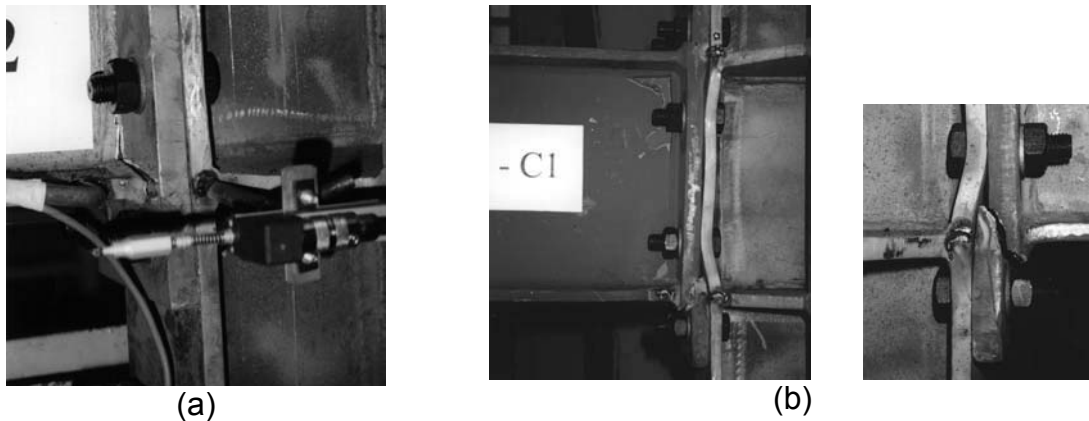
BX-SS-C2: Weld failure (a); BX-SU-C1: End plate failure (b)
